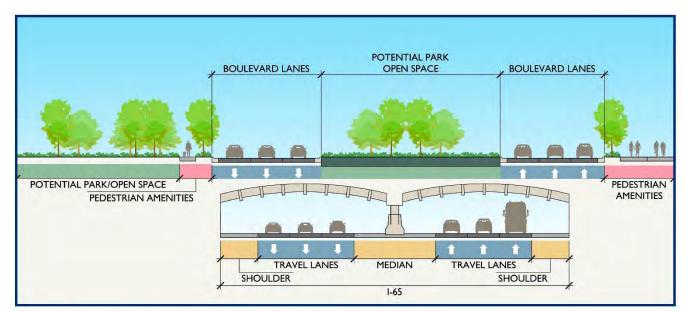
Concept 6 Boulevards and Interstate Tunnels
